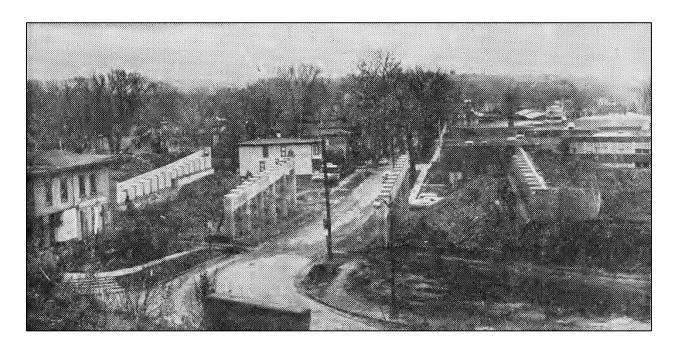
1964 photograph of earthen embankments and concrete pilings for construction of I-81 at East Castle Street.
